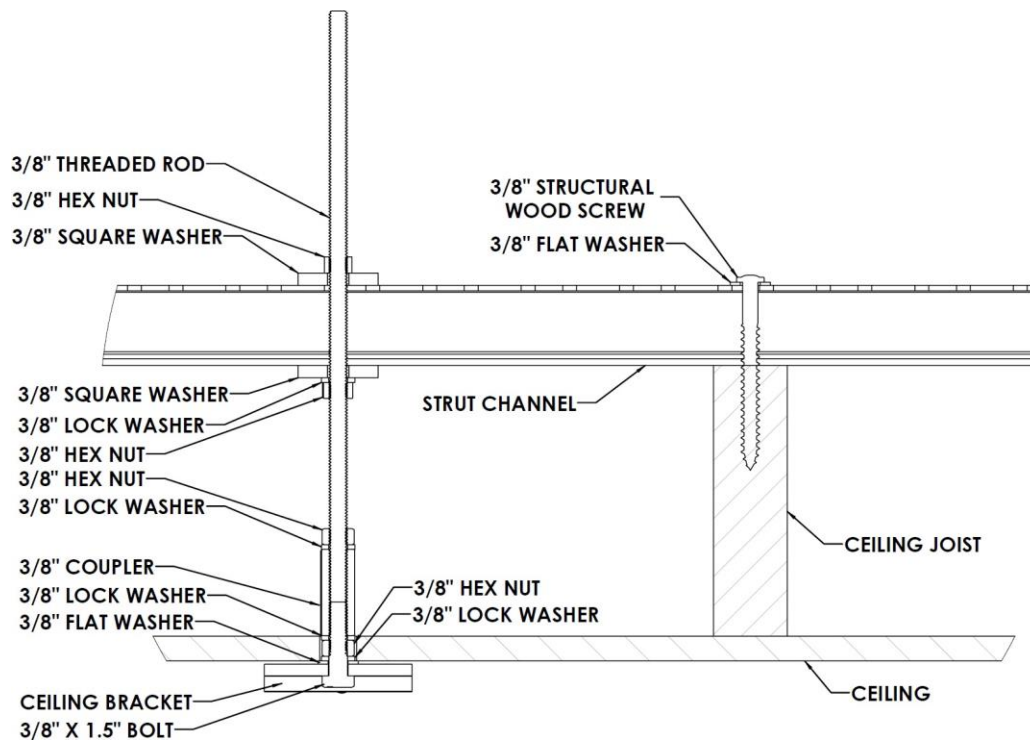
Top-Down Installation Ceiling Bracket Assemblies Ceiling Attachment
